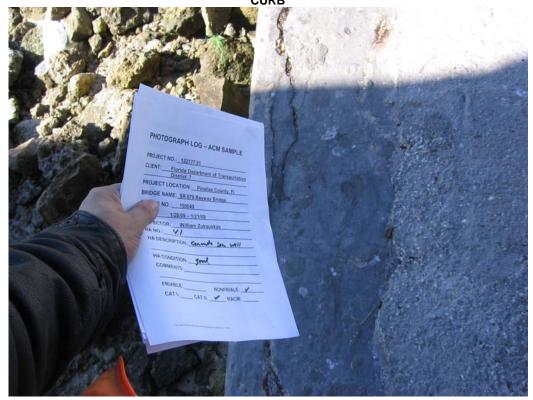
01/21/09 – SAMPLE 4.1 – HA 4 CONCRETE SEAWALL
